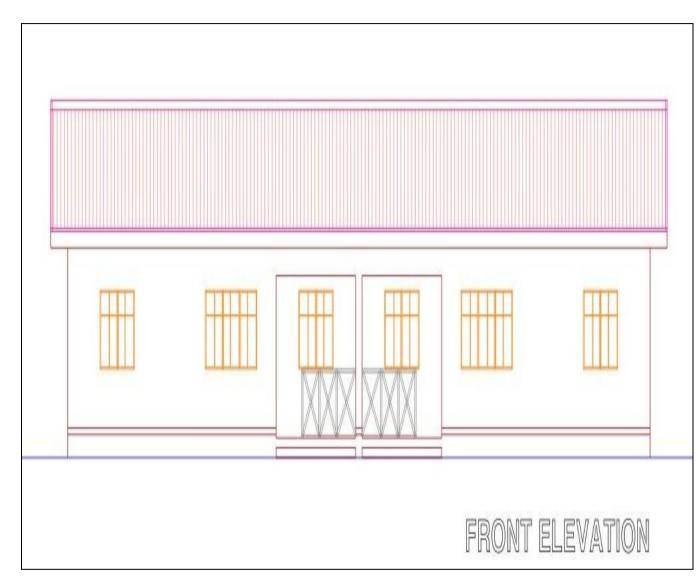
Typical Front Elevation of Low-Cost Houses Source: Field Survey (2014)
